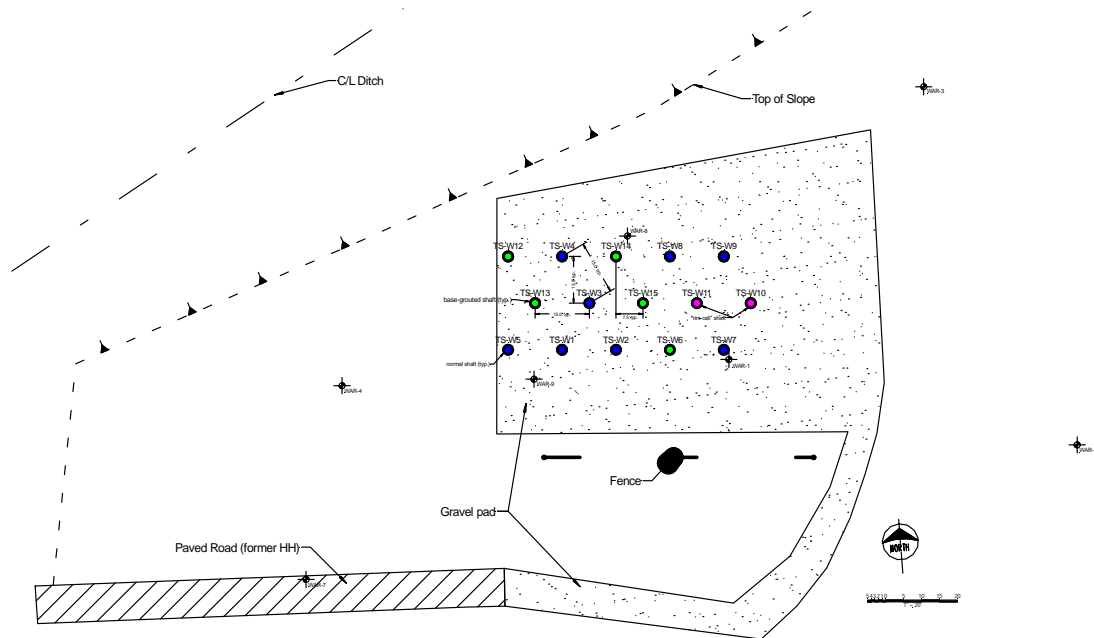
Layout of test shafts at the Warrensburg Load Test Site.
